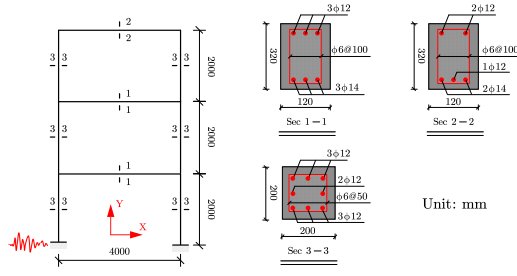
Elevation dimensions of reinforced concrete plane frame structure
